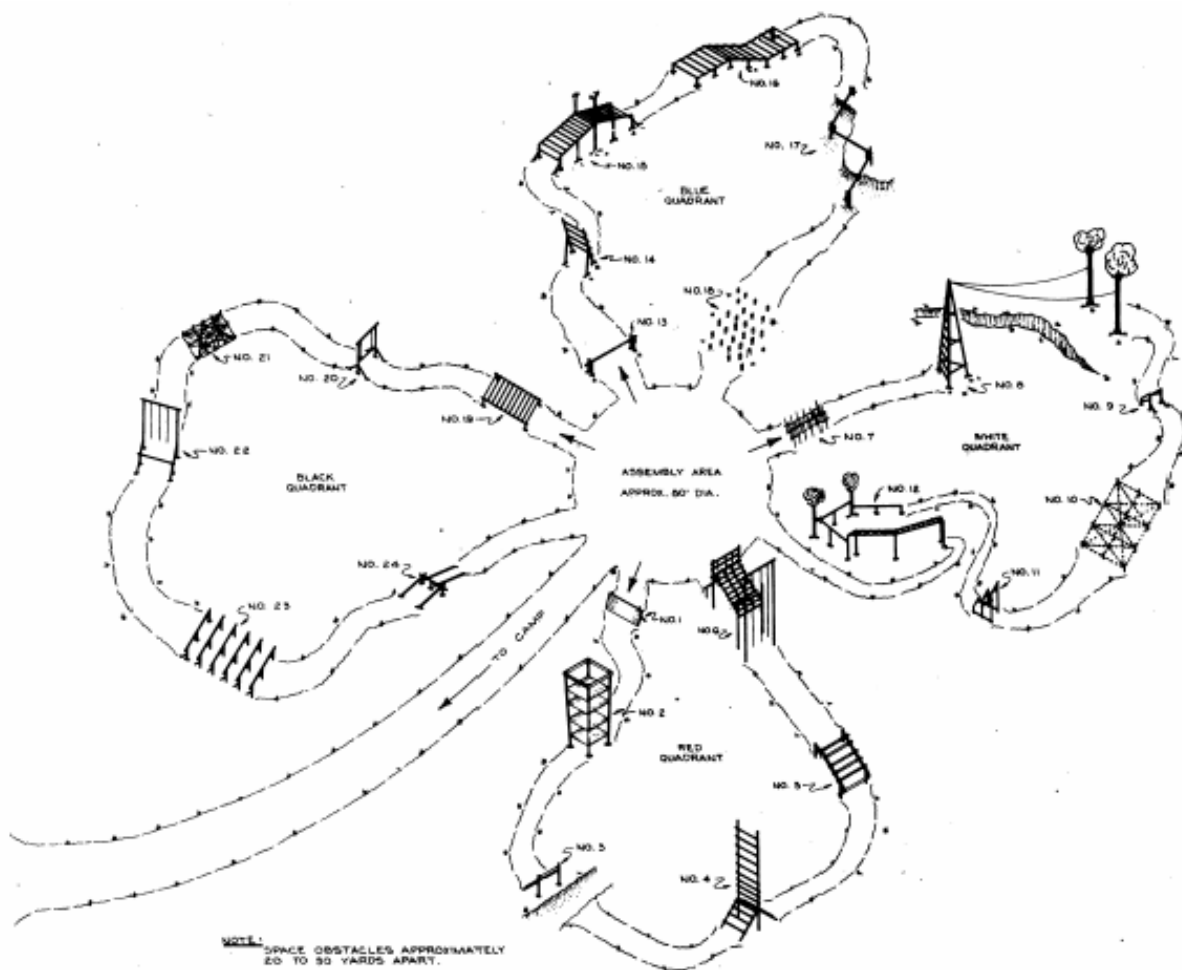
Confidence Course Layout Plan. From Sheet 1 of DEF 028-13-95. (U.S. Army Corps of Engineers 1952)
